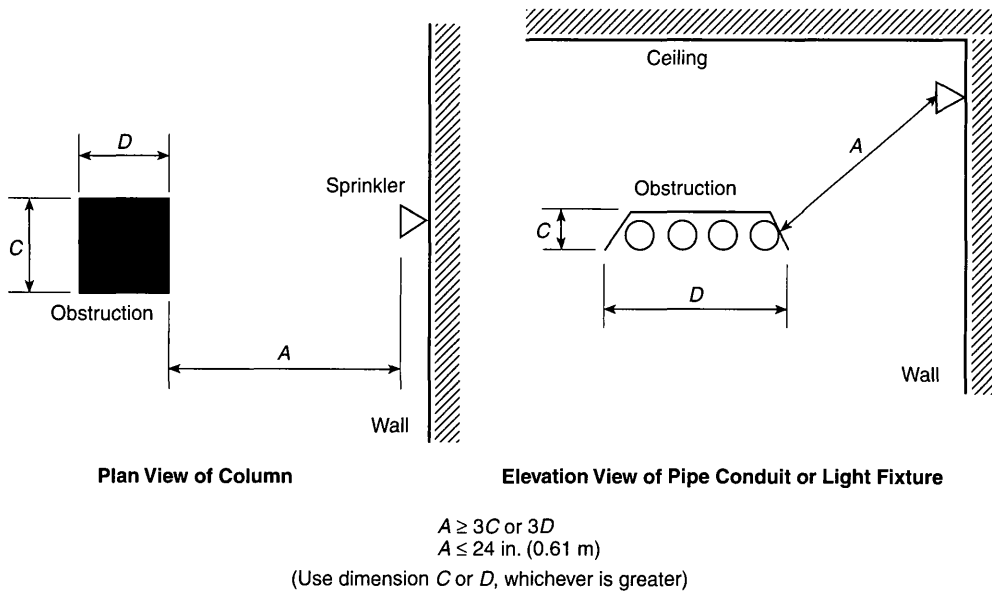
Positioning of Sprinklers to Avoid Obstructions Along the Wall (Standard Sidewall Spray Sprinklers).
